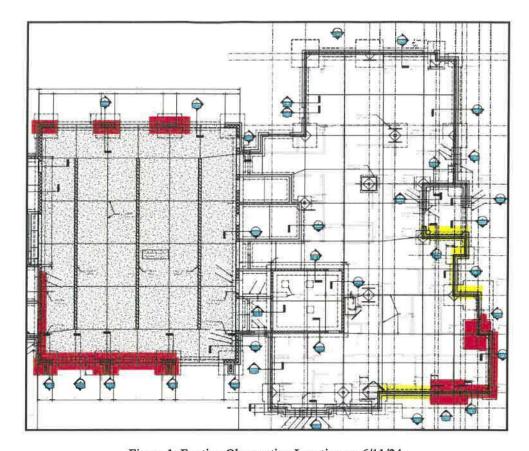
Footing Observation Location on 6/11/24 (Yellow indicates no over excavation required. Orange indicates areas that were over excavated and backfilled with lean concrete.)
